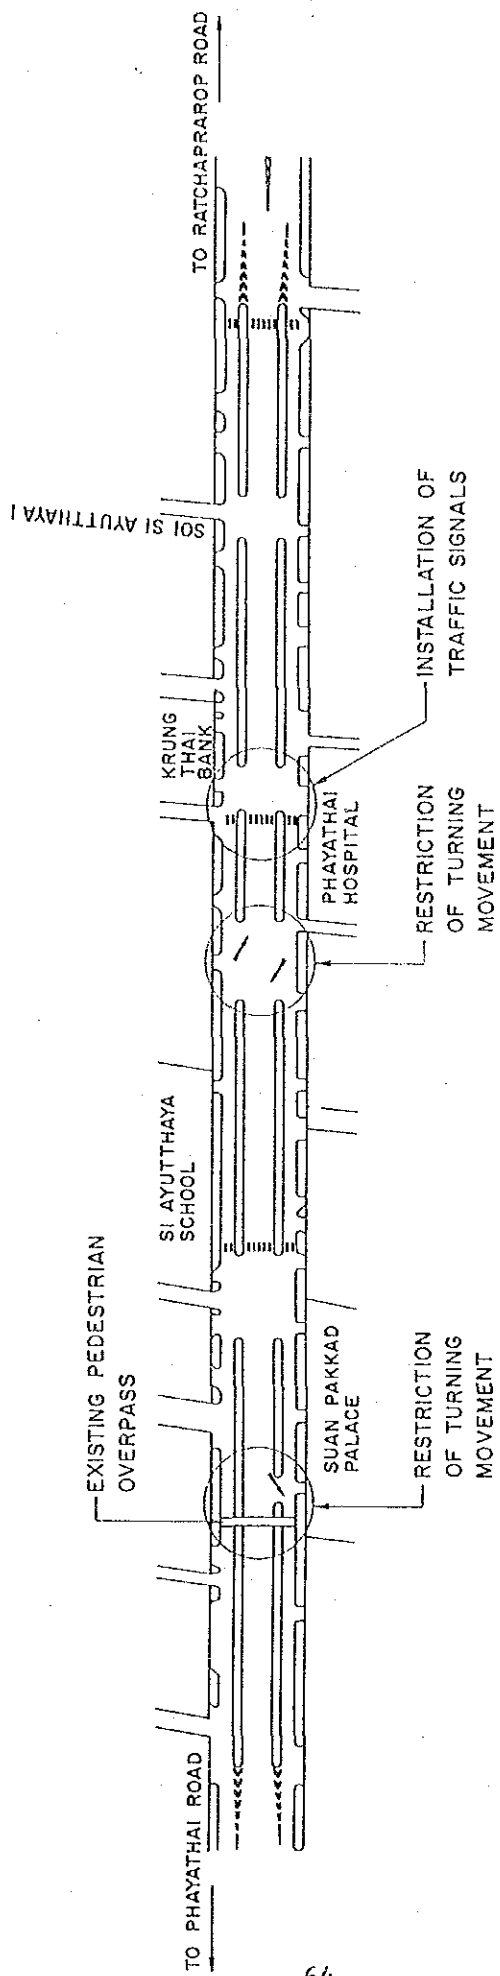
Proposed Safety Plan for Si Ayutthaya Road
